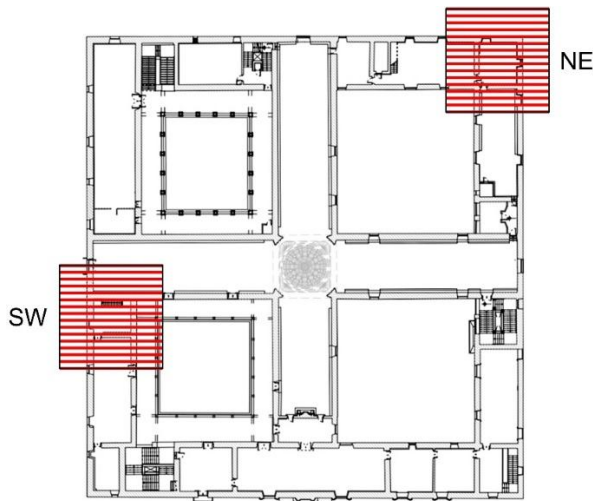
Location by facades of the rooms in the building. Room 1= NE and Room 2= SW
